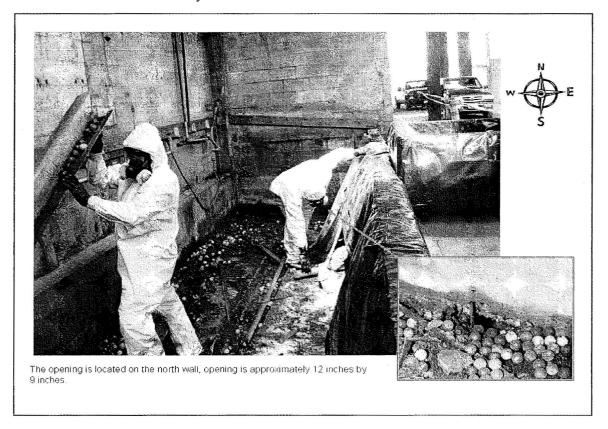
Tank containment area during cleanup. Inset shows hole discovered in northern wall.
